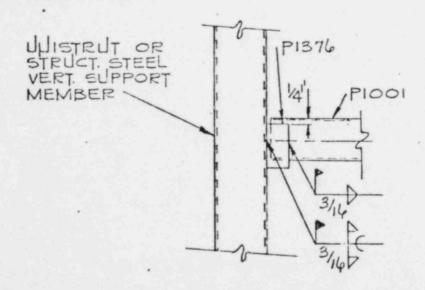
TYPICAL HORIZONTAL TO VERTICAL STRUCT. MEMBER CONNECTION
